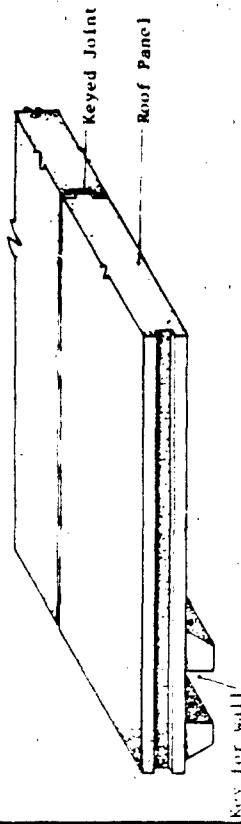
KEYED JOINTS FOR PRECAST ELEMENTS.
